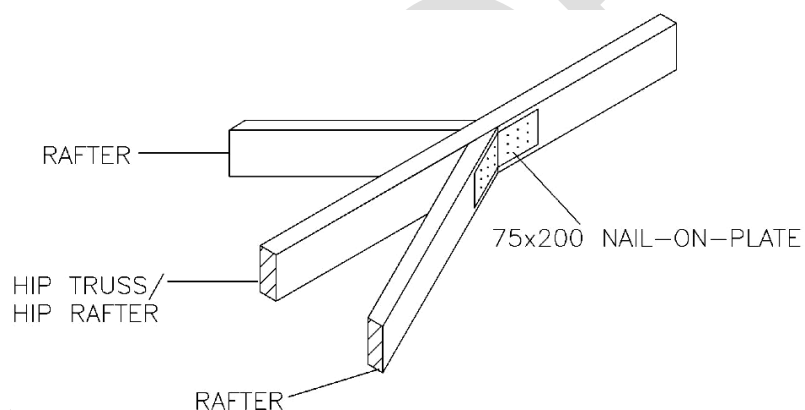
Rafter/Jack Truss Longer Than 1800mm
